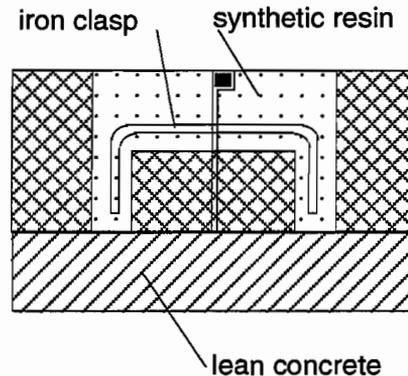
Longitudinal joint construction in prefabricated portland cement concrete slab
